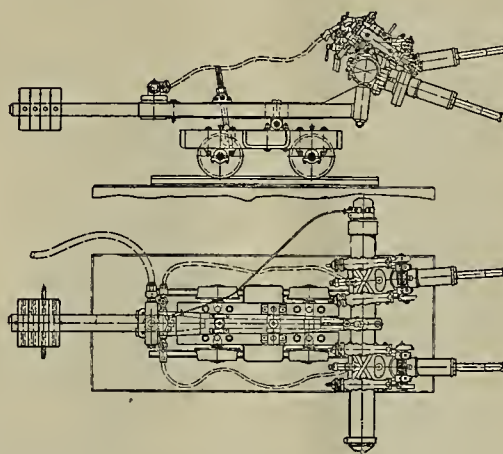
Elevation and Plan of Drill Used in the Tunnel.
